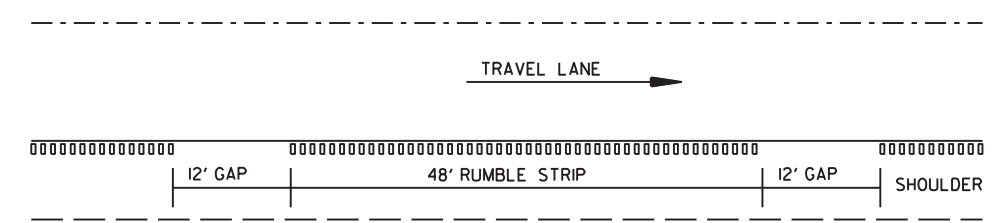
DETAIL FOR RUMBLE STRIP GAP AT DRIVEWAY TURNOUTS
